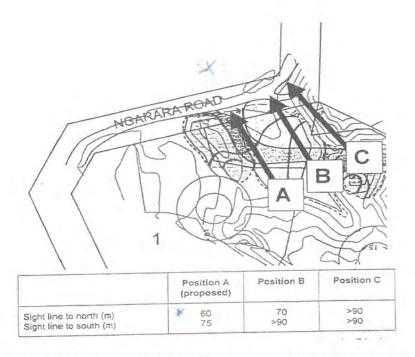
Sightline measurements along the intersection of Jacks Bush Road with Ngarara Road. (Source: Report by Barclay Traffic Planning, 2003)
